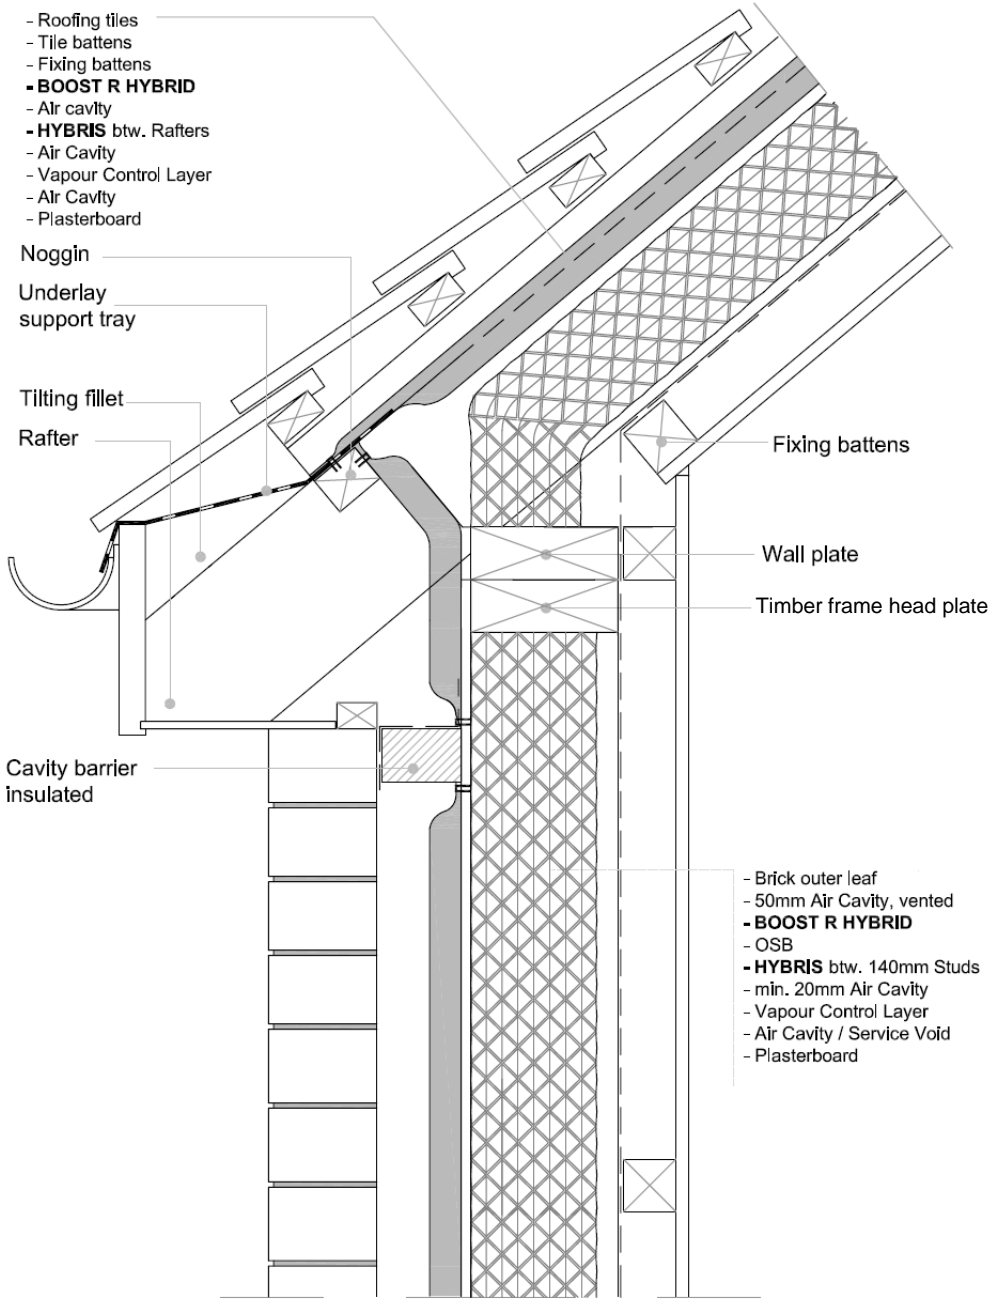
Eaves detail - Over rafter and timber frame wall with additional insulation
